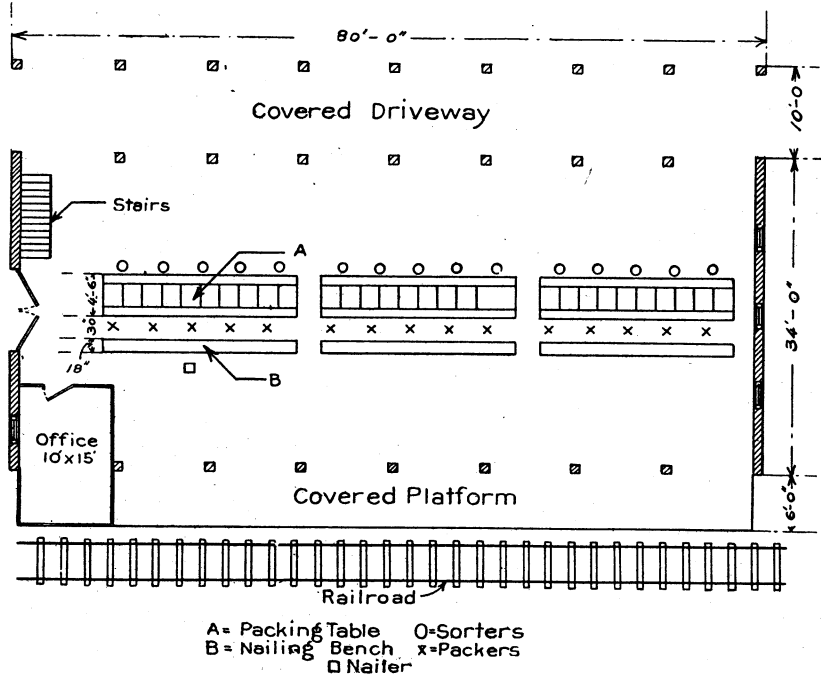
Floor plan of the packing house illustrated in fig. 11.
